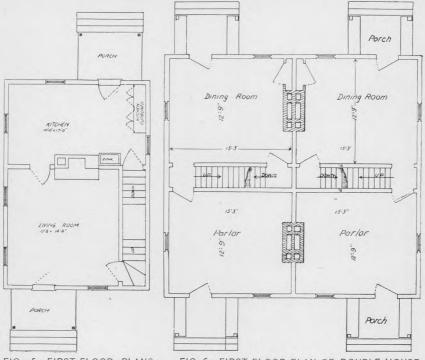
FIRST-FLOOR PLANS OF ONE-FAMILY HOUSE.
